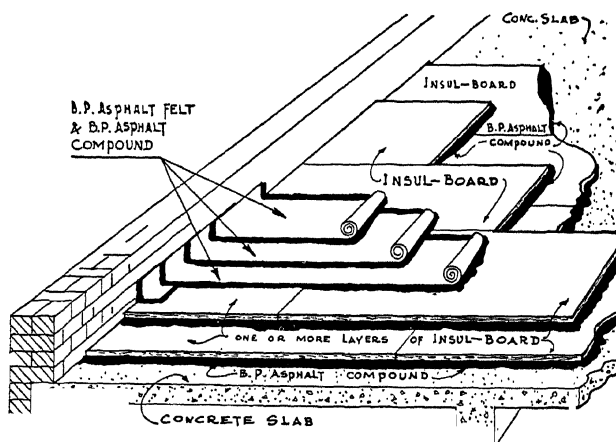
Section of Concrete Roof Showing Application of Rigid Insulation
